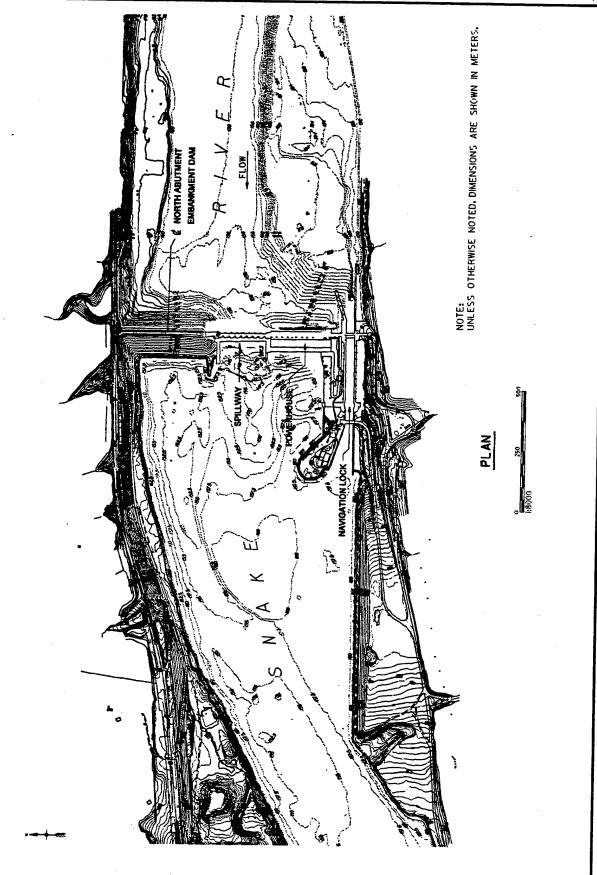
Little Goose – Existing Project Arrangement General Plan
